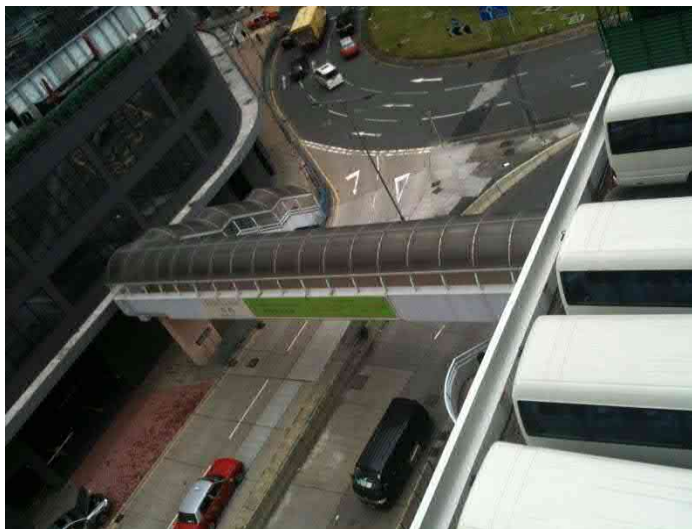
Existing Footbridge Across Wai Yip Street near Roundabout with Hoi Yuen Road
